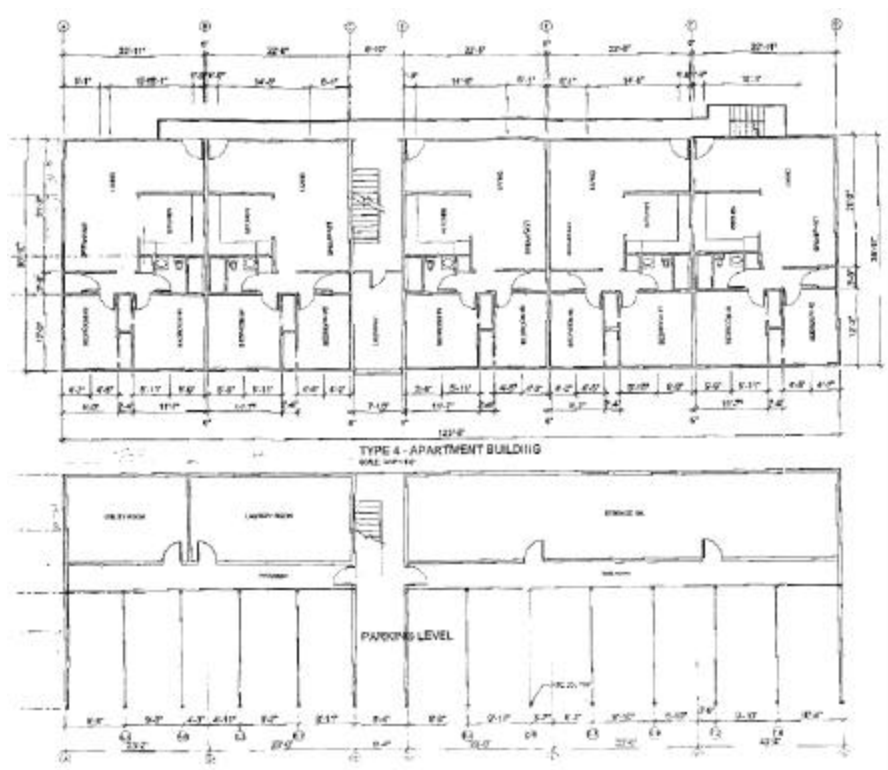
Plan Views of Apartment Index Building (Cobeen 2001).
